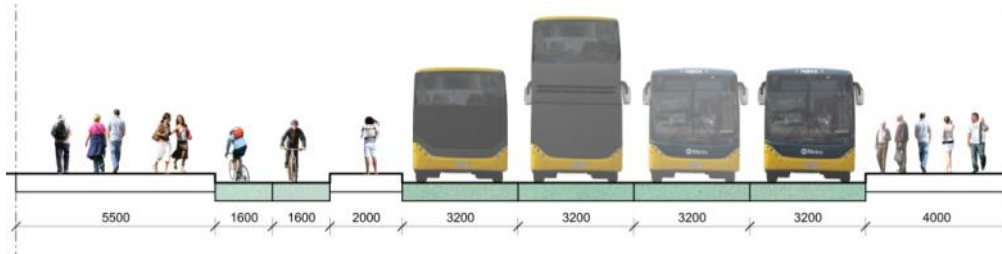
Wellesley Street typical cross section: Queen to Lorne
